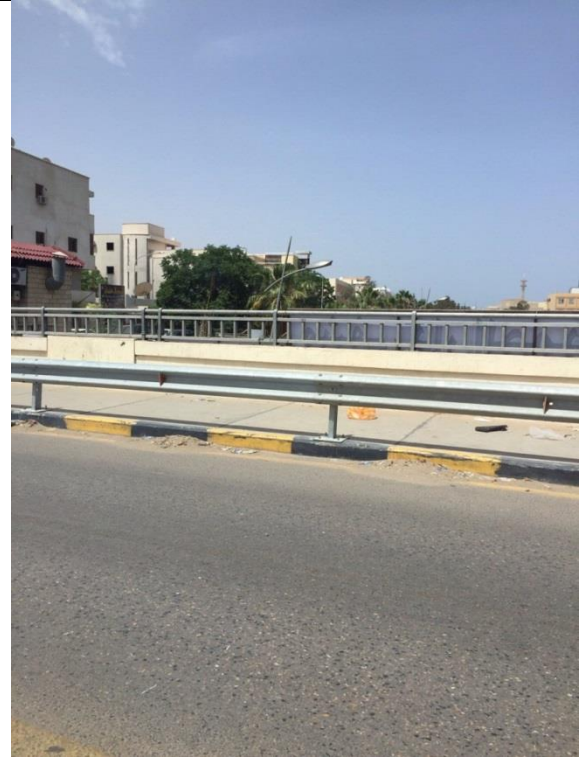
A general view of metal part of fences, curbs and Guardrail on the bridge
